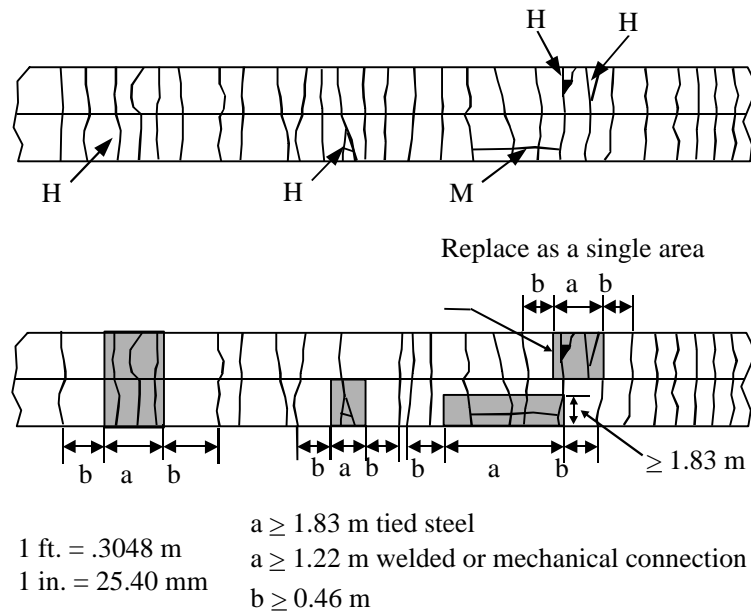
Repair recommendations for continuously reinforced concrete pavements.
